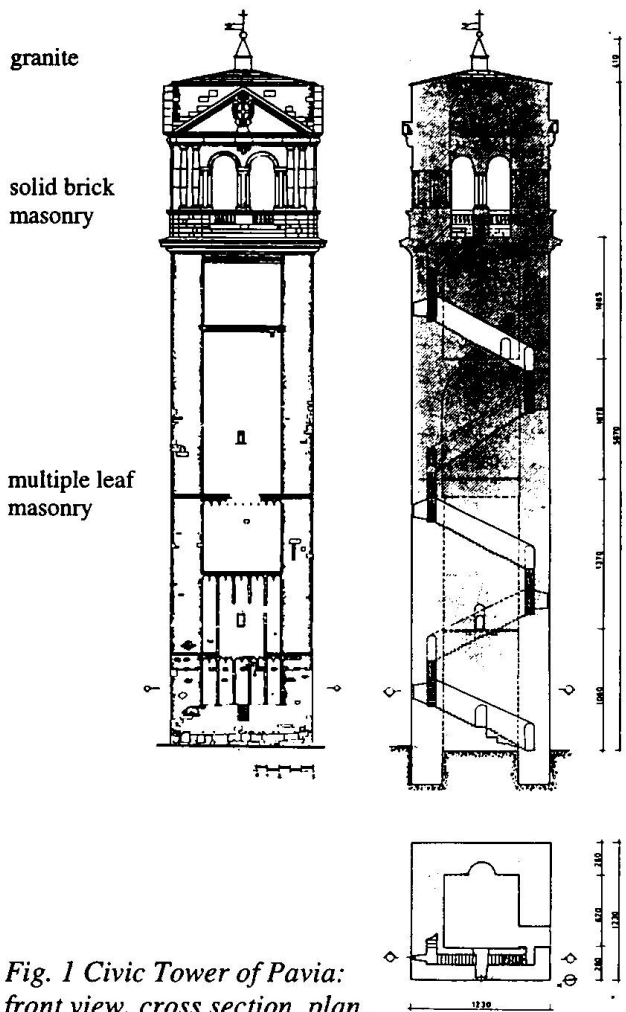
Civic Tower of Pavia: front view, cross section, plan.
